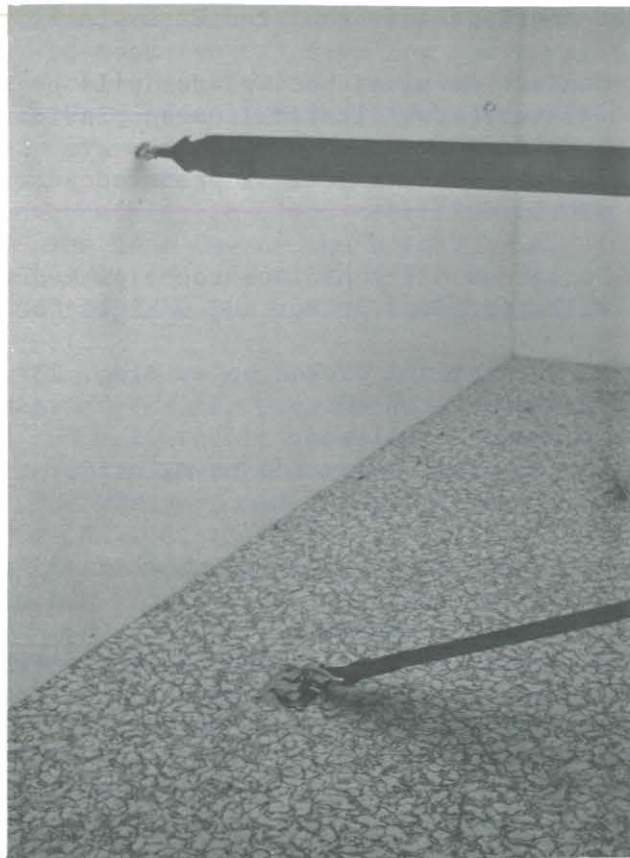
A close-up view of the floor brackets and wall loop bolts showing nylon straps attached.
